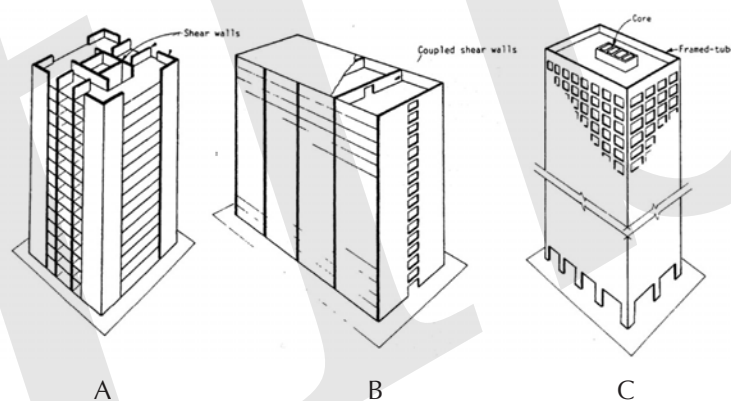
Application of precast walls to tall building structural systems (A-shear walls, B-coupled walls, C-tube in tube) .
